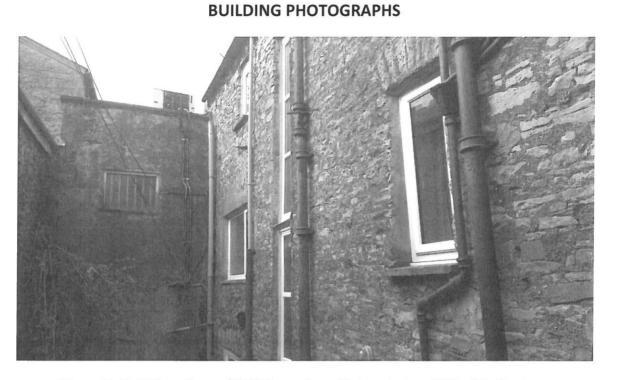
First Floor Rear of Buildings - Long Stairs window @ No.3 in Centre.
